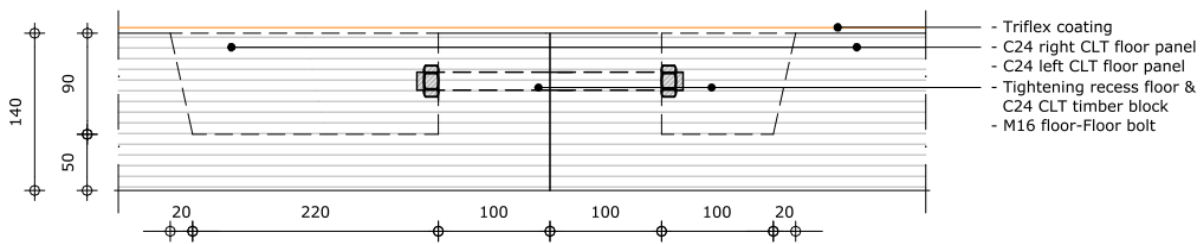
Cross-section A-A final design floor-to-floor connection in mm
